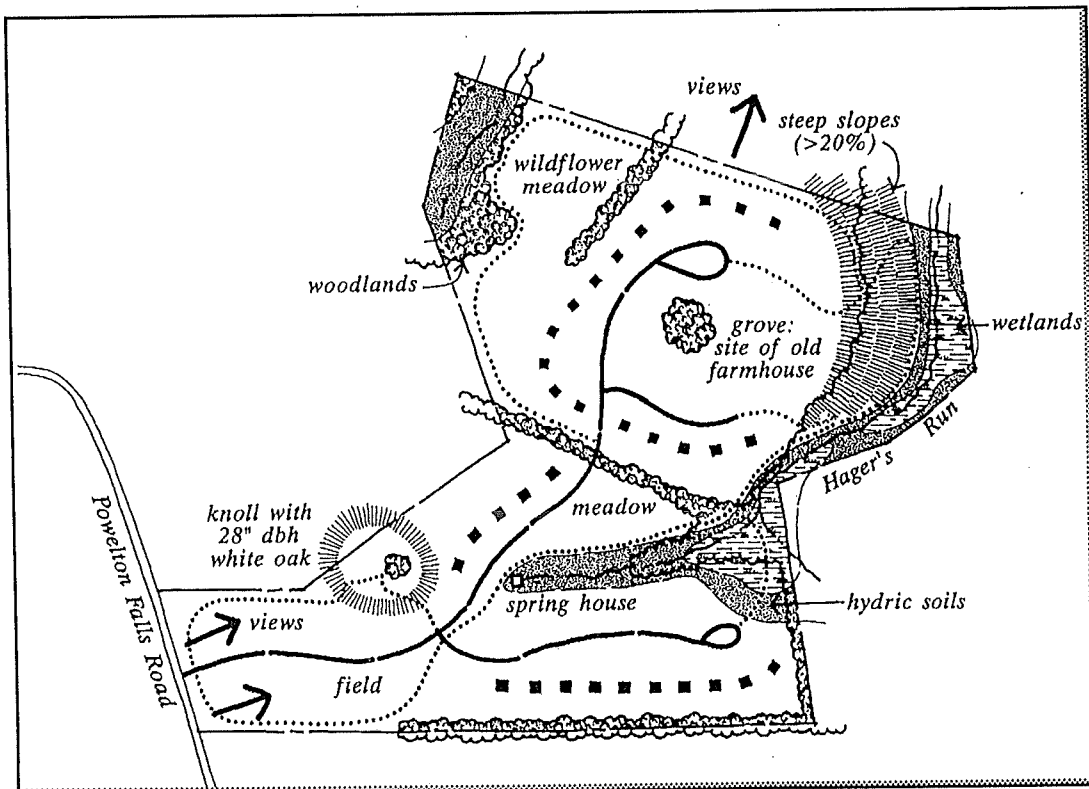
Designing Road Alignments and Trail Links
